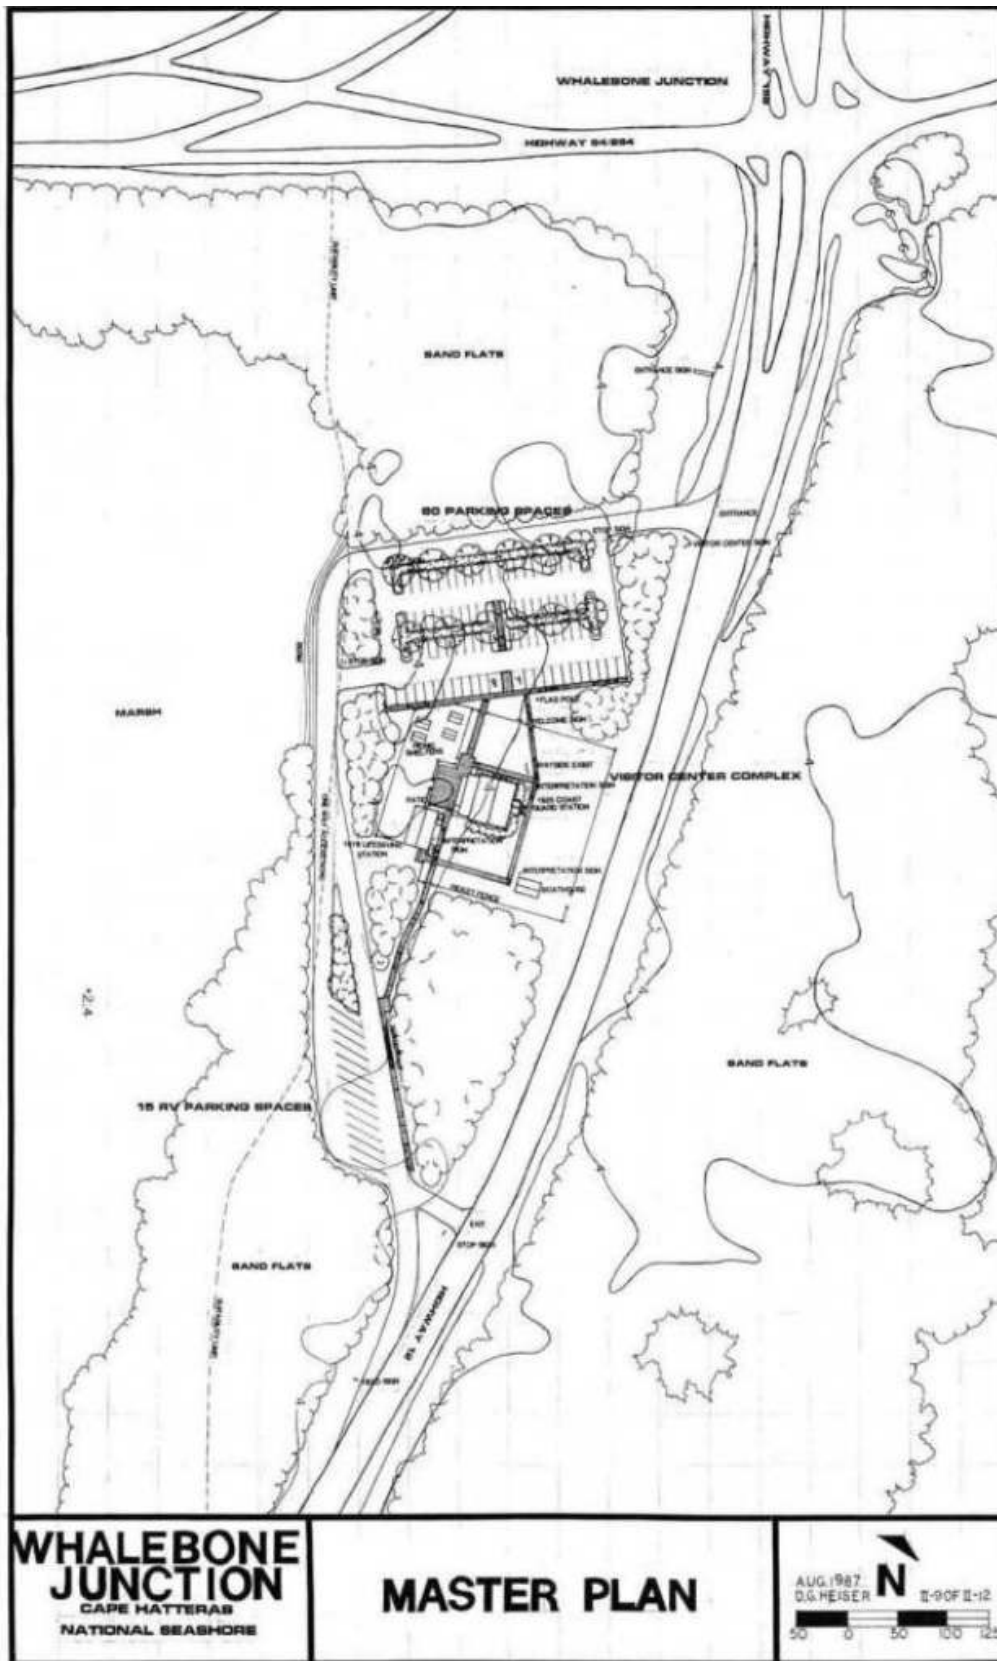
Proposed site development plan to relocate the Complex to the Whalebone Junction site. (Heiser 1987 in Oppermann 2005b)
